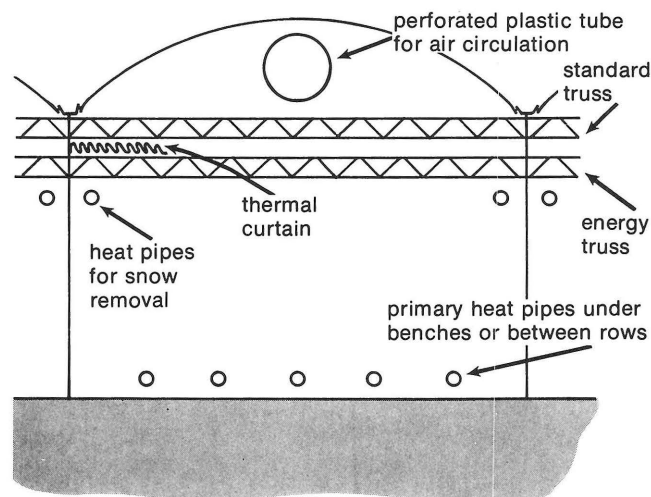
B.3. Possible layout of an energy truss greenhouse.
